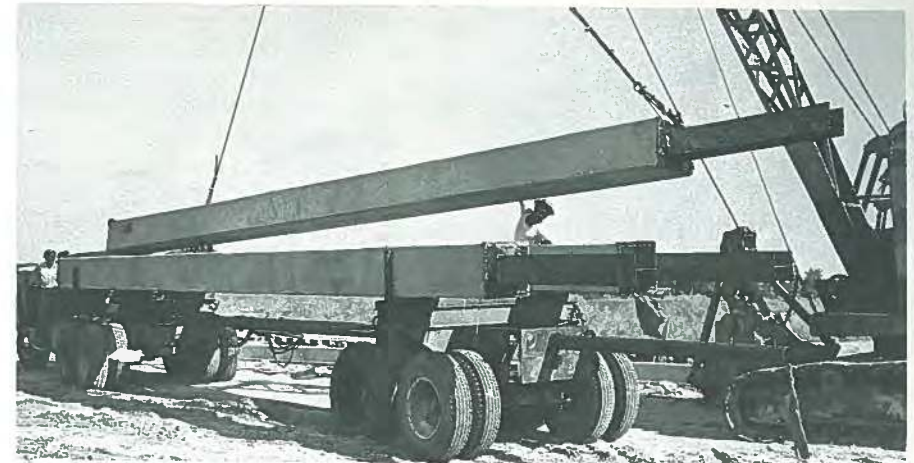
A pretensioned pile (with wide flange steel beam used for rock penetration) being transported to field demonstration test site.
